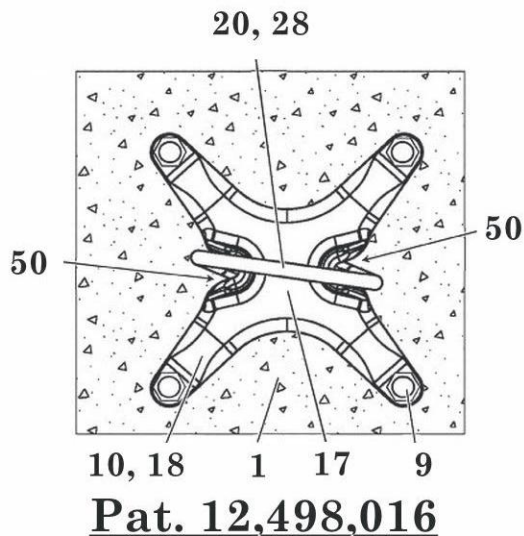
Bottom view of the hoist point anchor of figure 1, and a ceiling to which the hoist point anchor is anchored through anchor bolts.
